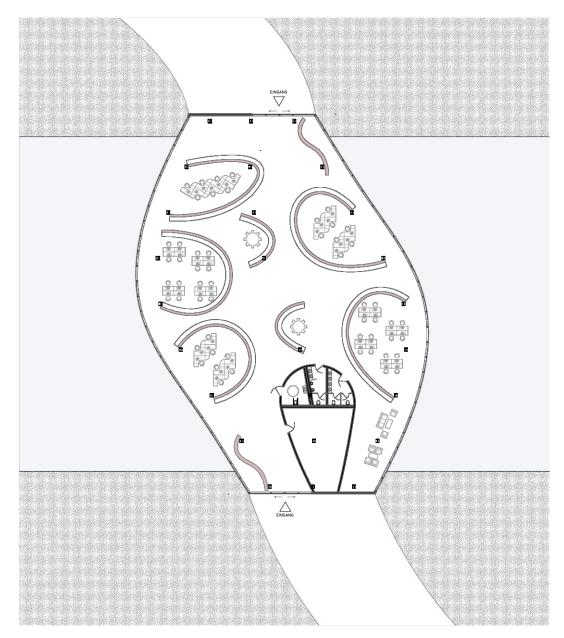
Floor plan - Building is used as a coworking space
